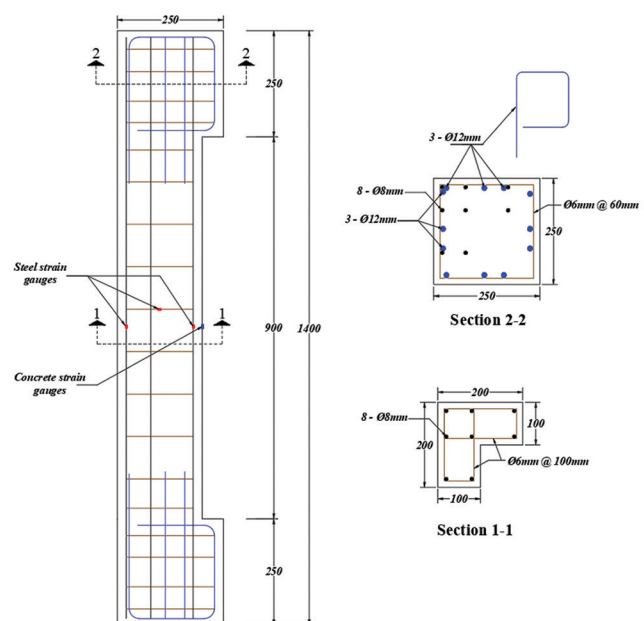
Details of the column steel reinforcement specimens (as defined in mm).
